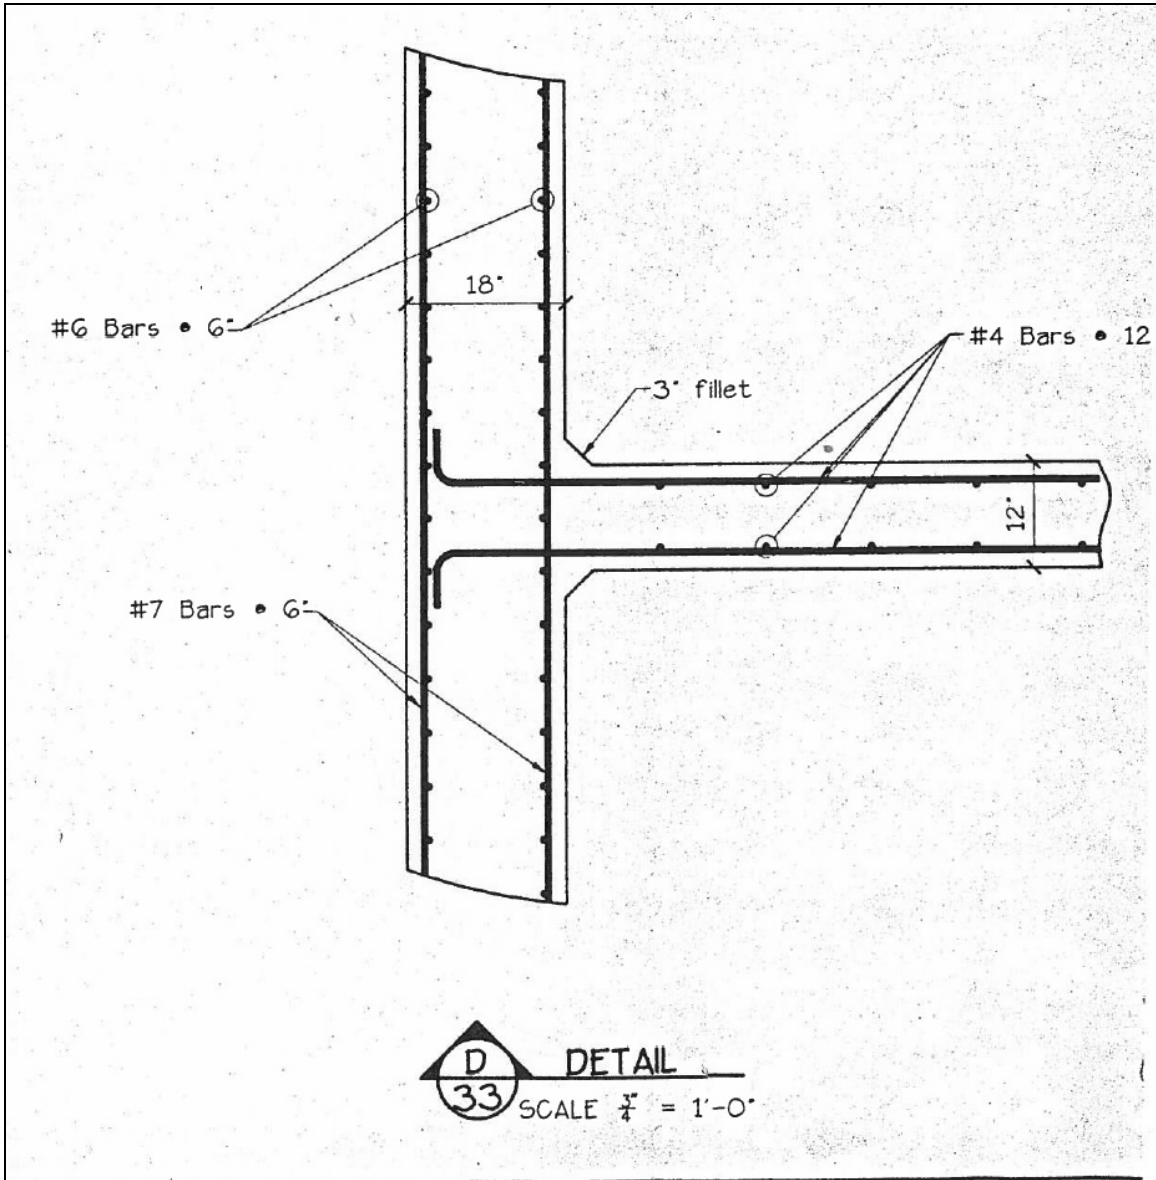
Plan Showing Reinforcement at the Wall Intersections
